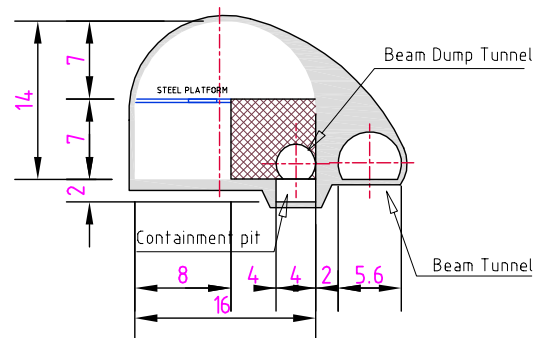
Structure of Main Beam dump tunnel and cavern
